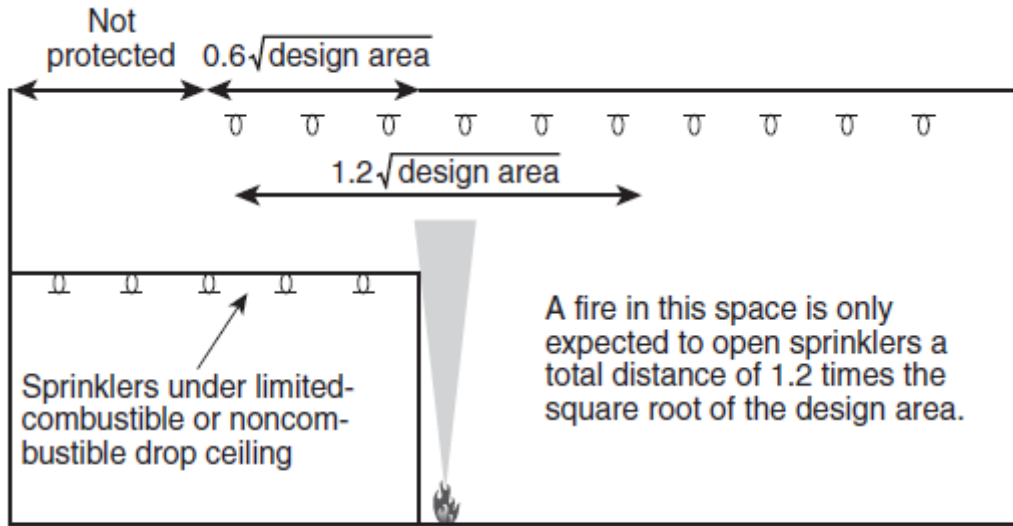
Extension of Sprinkler System Above Drop Ceiling.
